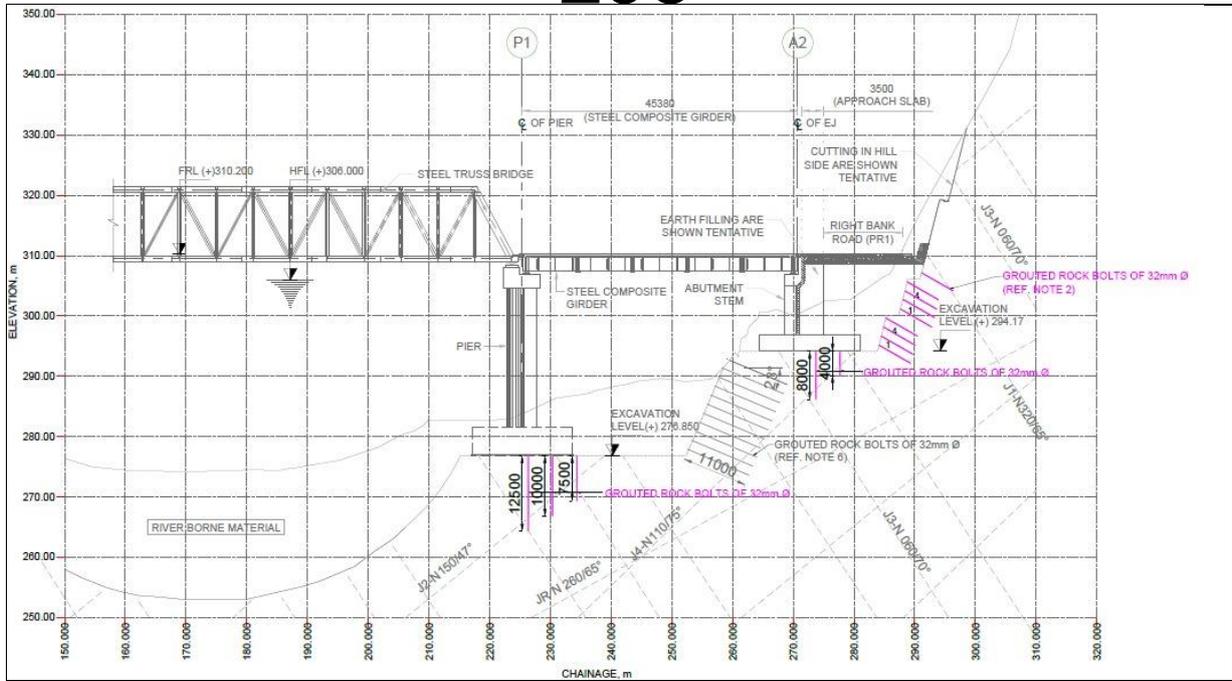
Slope Protection and Stabilization measures at Dibang Bridge Pier after removal of cofferdam
